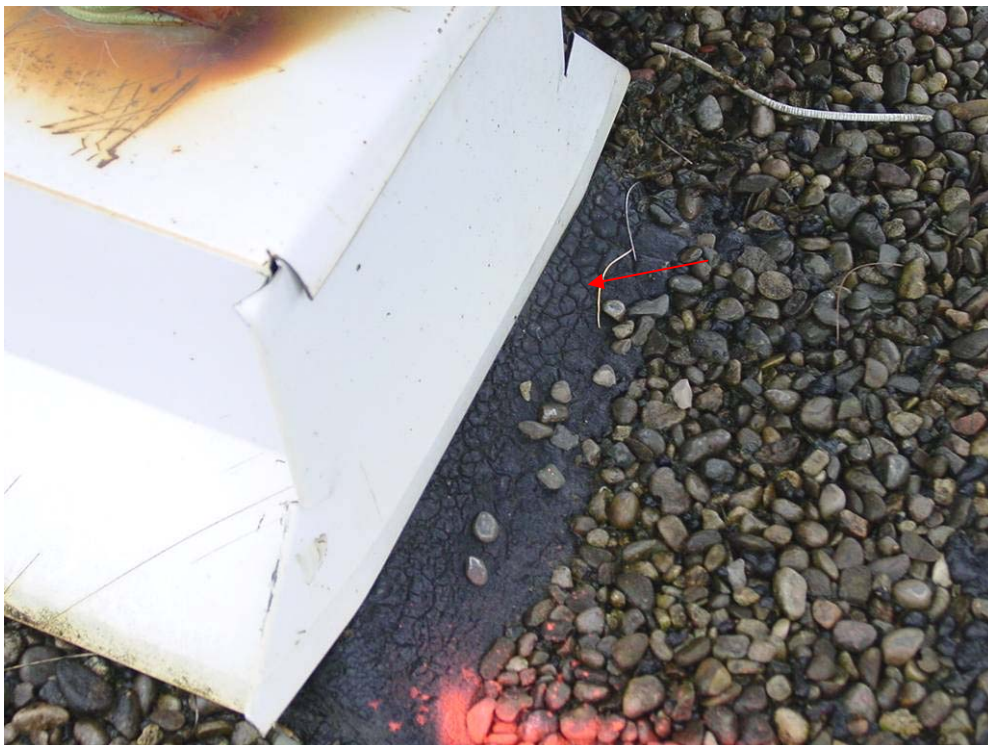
Roof Area 1.1 – Sealant deterioration and a lack of proper rain collars could be contributing to water entry.
